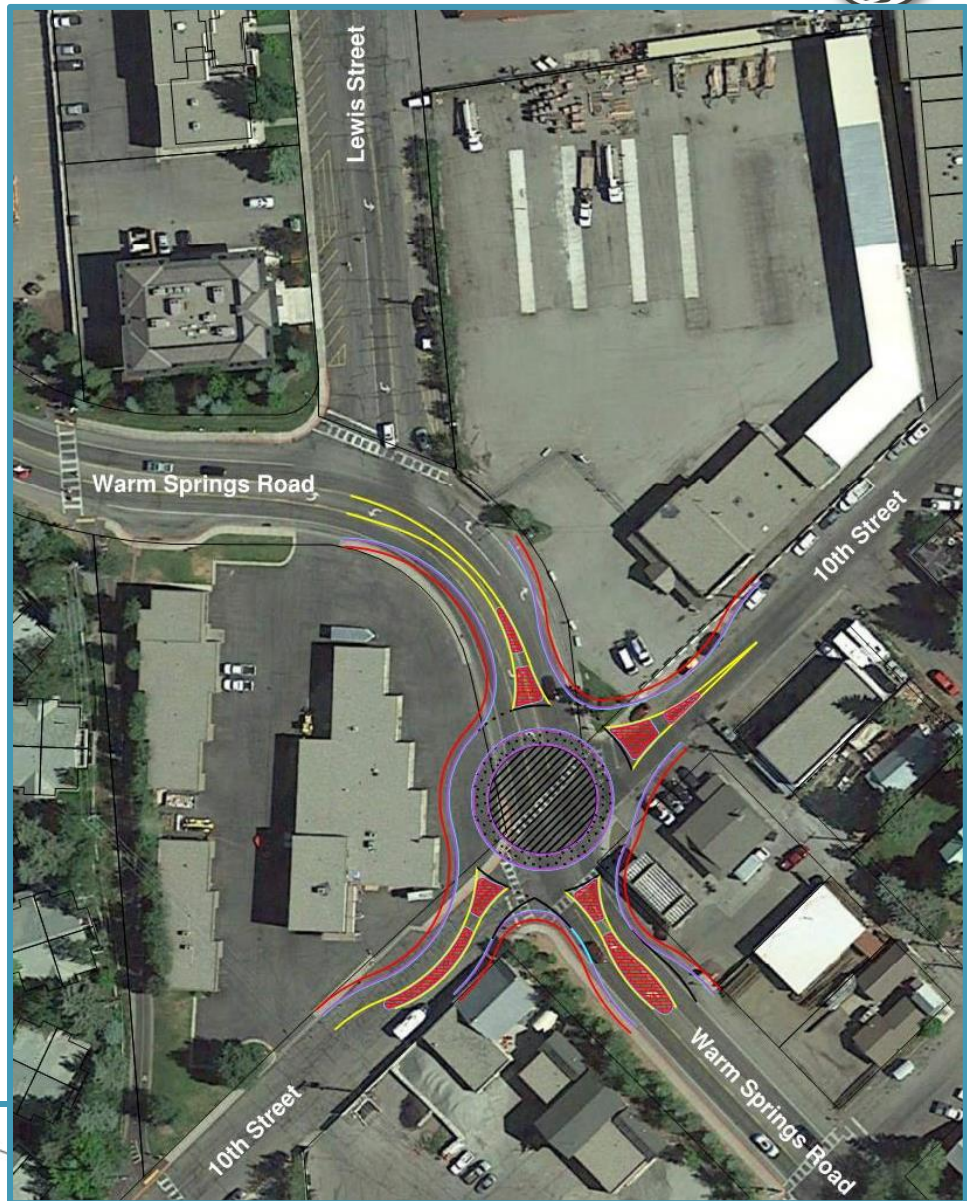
Warm Springs Road and 10th Street Single Lane Roundabout Concept
